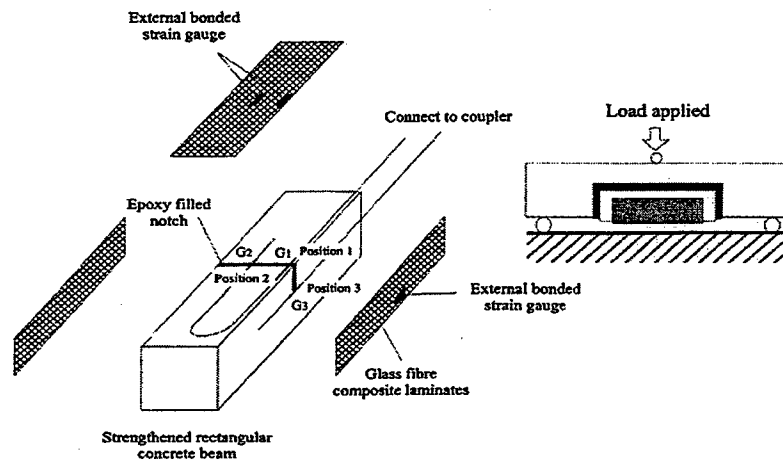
Schematic of the test specimen showing the location of the FBG sensors and the loading setup
